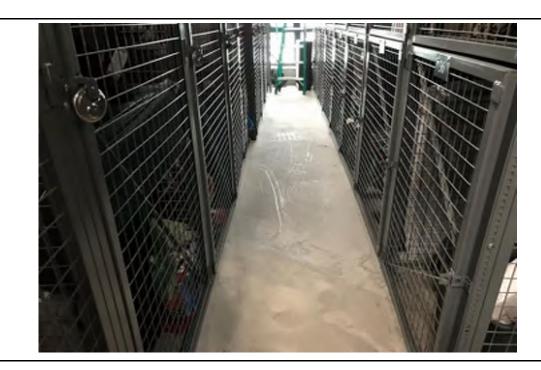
First floor concrete slab in tenant storage space, facing southwest. 30 March 2021.
